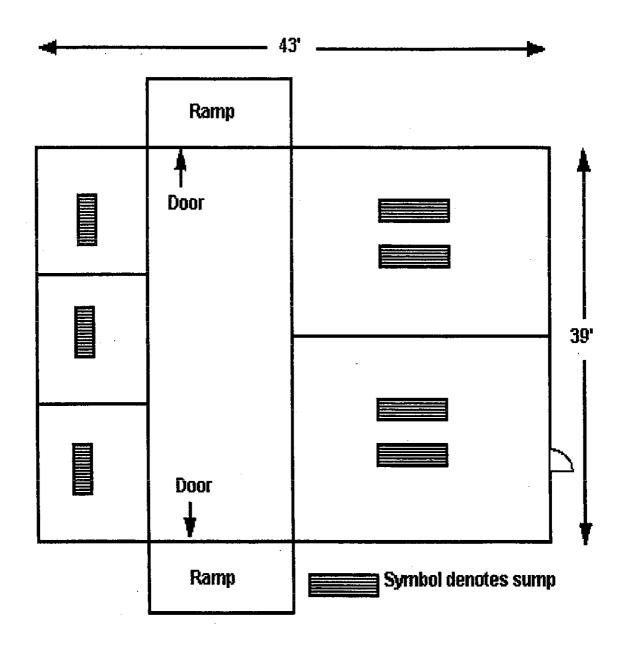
Long-Term Hazardous Waste Storage Facility, Building 7654.
